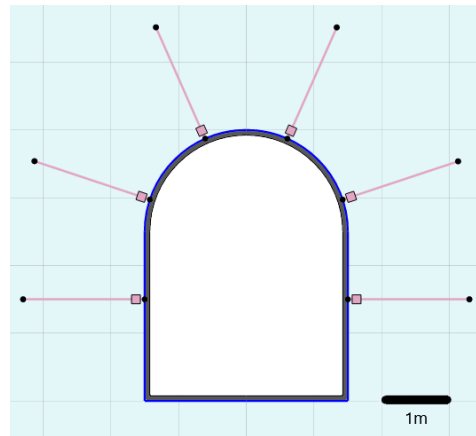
Typical support method for an ore drive. The bolts are 1.8 m long split sets, with a shotcrete layer of up to 75 mm.
